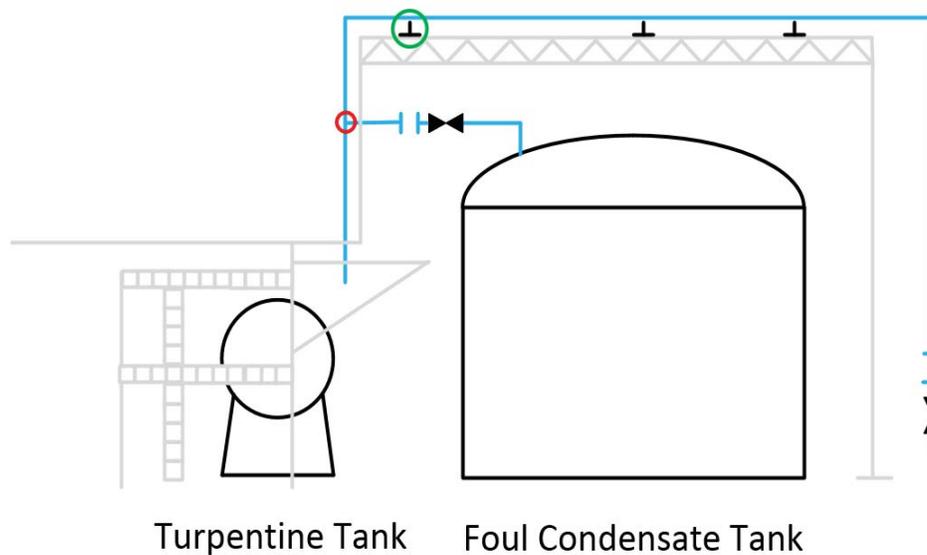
Simplified Drawing of the Scope of Work Conducted on the Water Piping. The scope of work on the water piping required three tasks: (1) disconnect and move water piping back onto its piping rack, (2) fix a crack in the water piping at the intersection of the three-inch line that connected to the foul condensate tank (smaller red circle), and (3) weld a guide onto the piping rack to prevent the water piping from slipping off of the pipe rack in the future (larger green circle).
